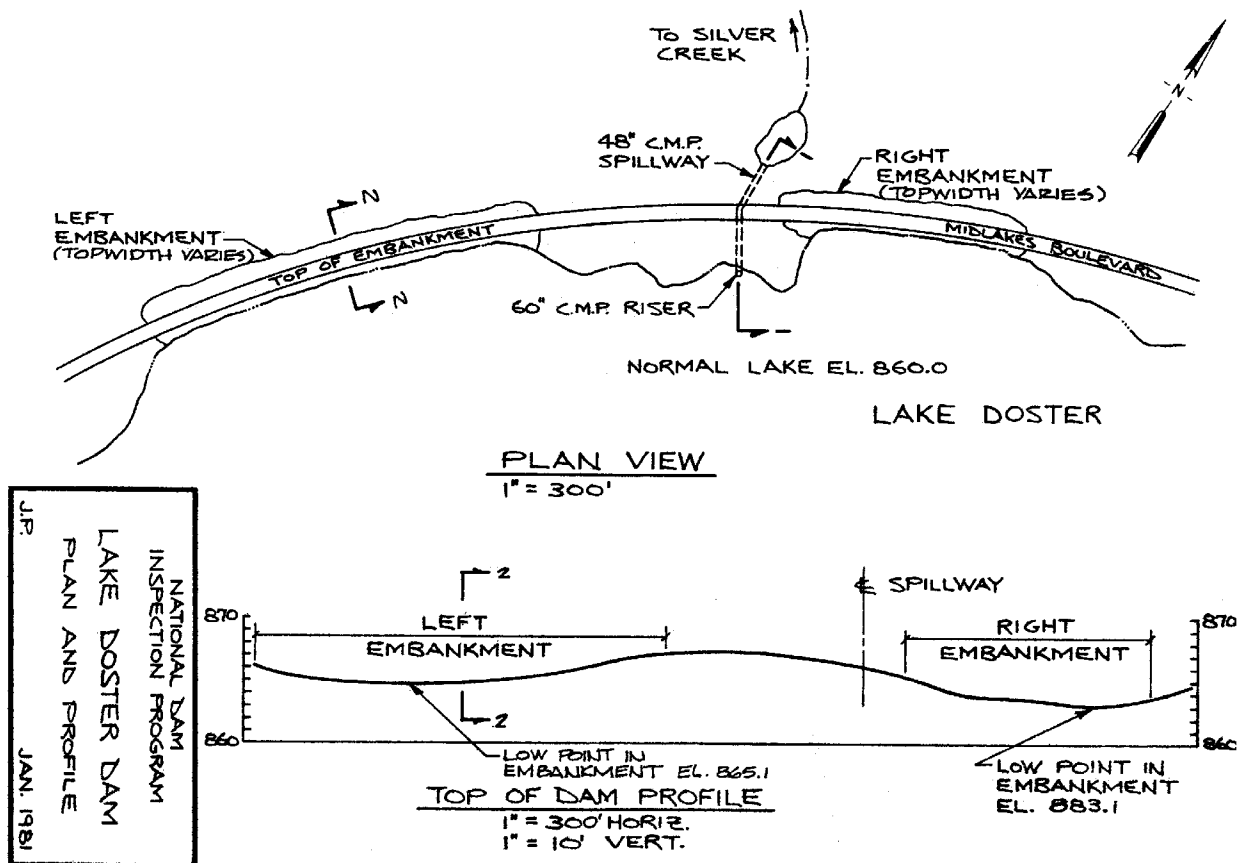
Lake Doster dam plan and profile. (Source: Owen Ayres and Assoc. 1981.)
